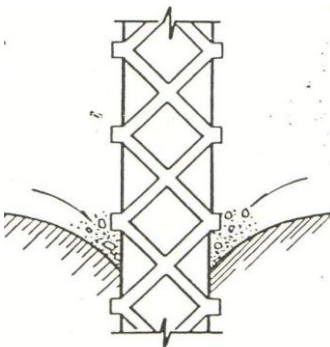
Concrete pile with Deformations and added (Rosenblueth, 1984; Ejezie, 1987)
